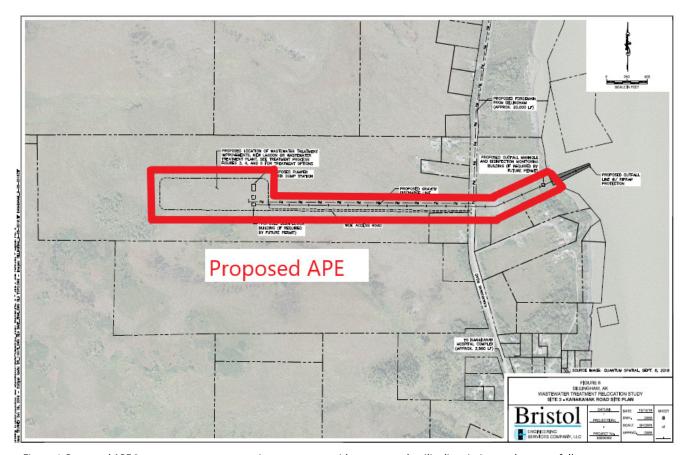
Proposed APE 3 – wastewater treatment improvements with access road, utility line tie-ins, and new outfall zone.
